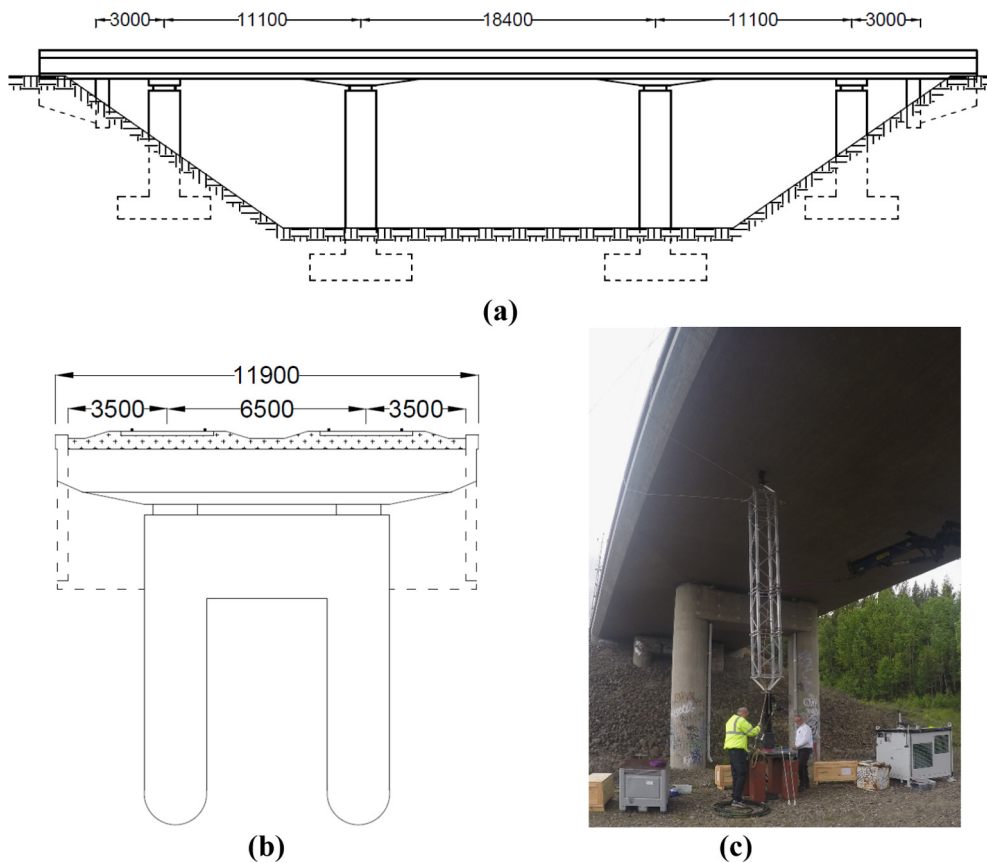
Schema of host bridge structure with (a) Side elevation, (b) Front elevation and (c) Hydraulic shaker unit.
